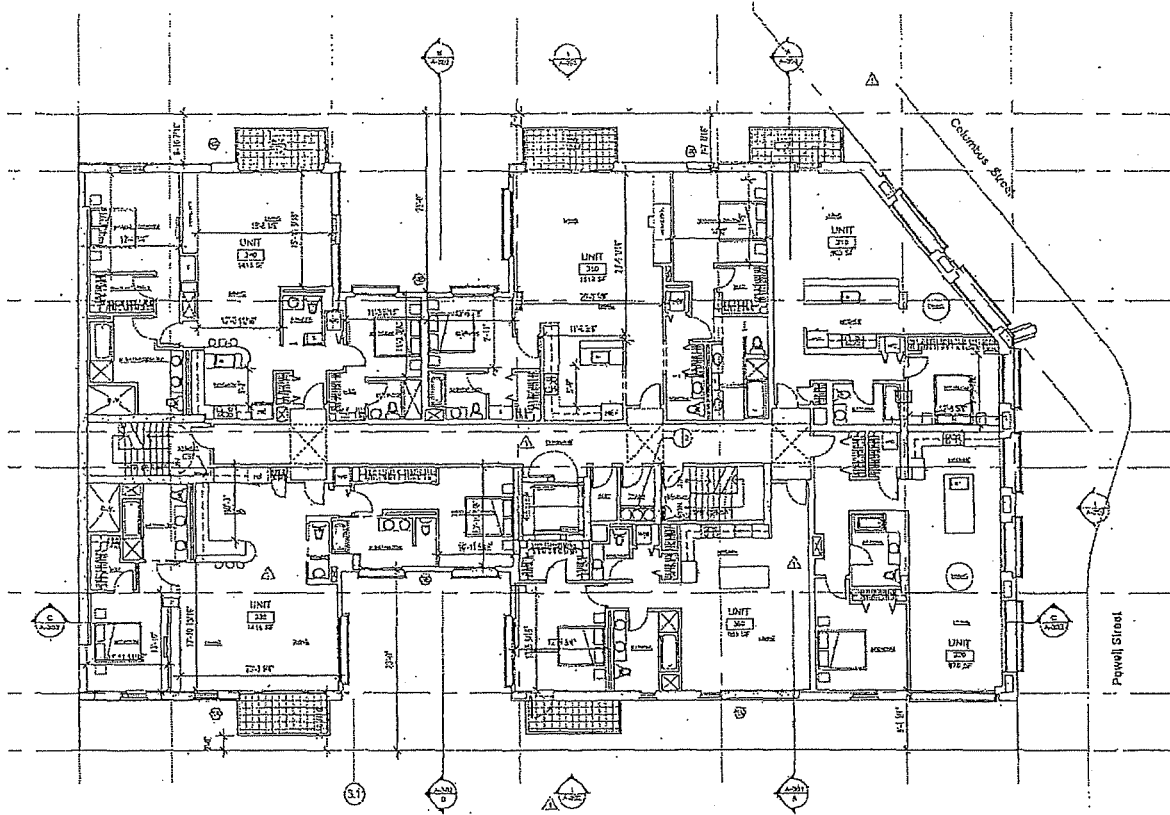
PROPOSED 1731 POWELL ST THIRD LEVEL PLAN
